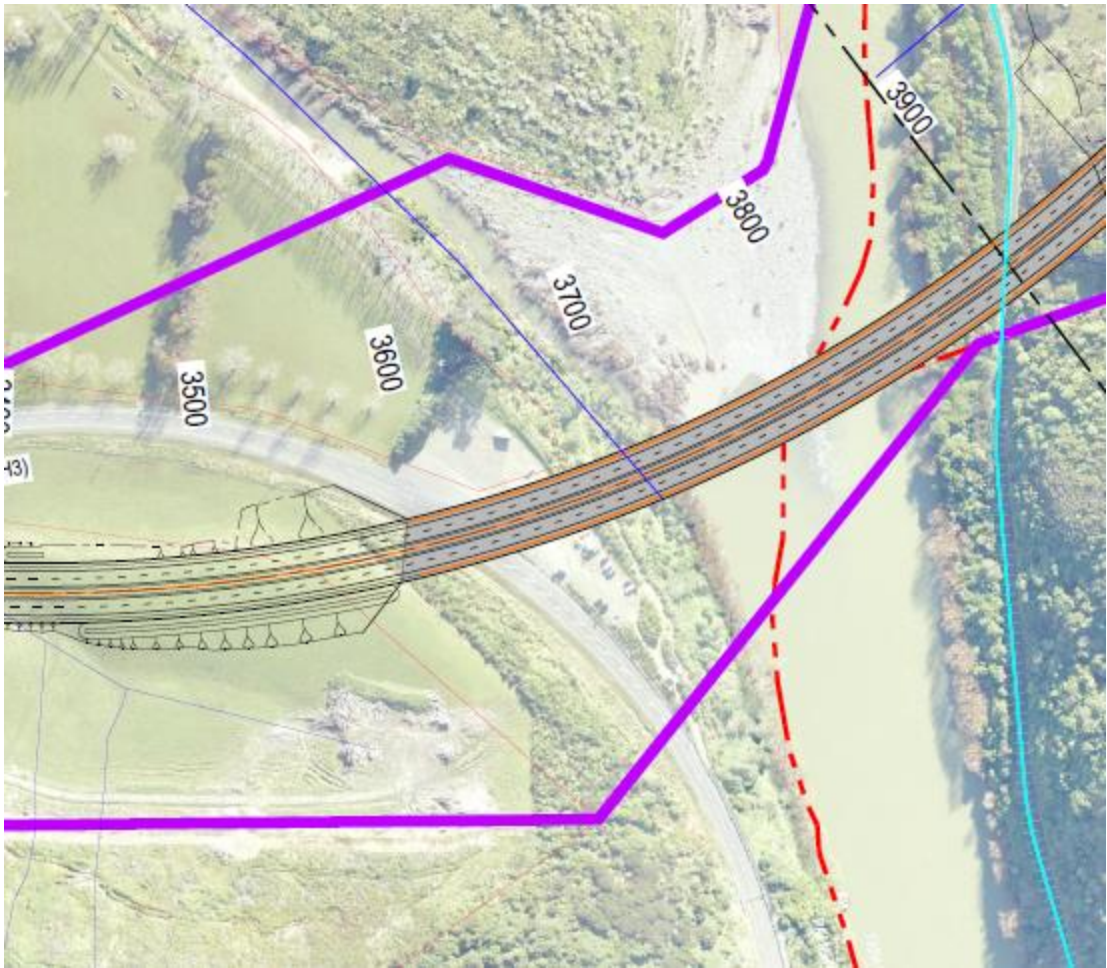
Manawatū River Bridge – South Abutment position - DBC recommended option
